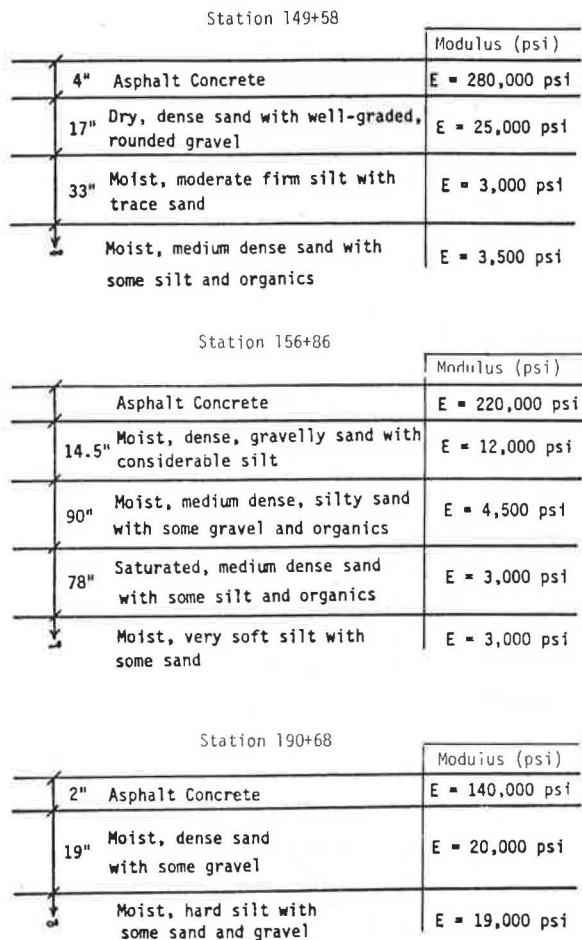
Typical cross sections and material parameters of various stations on SR-20.
